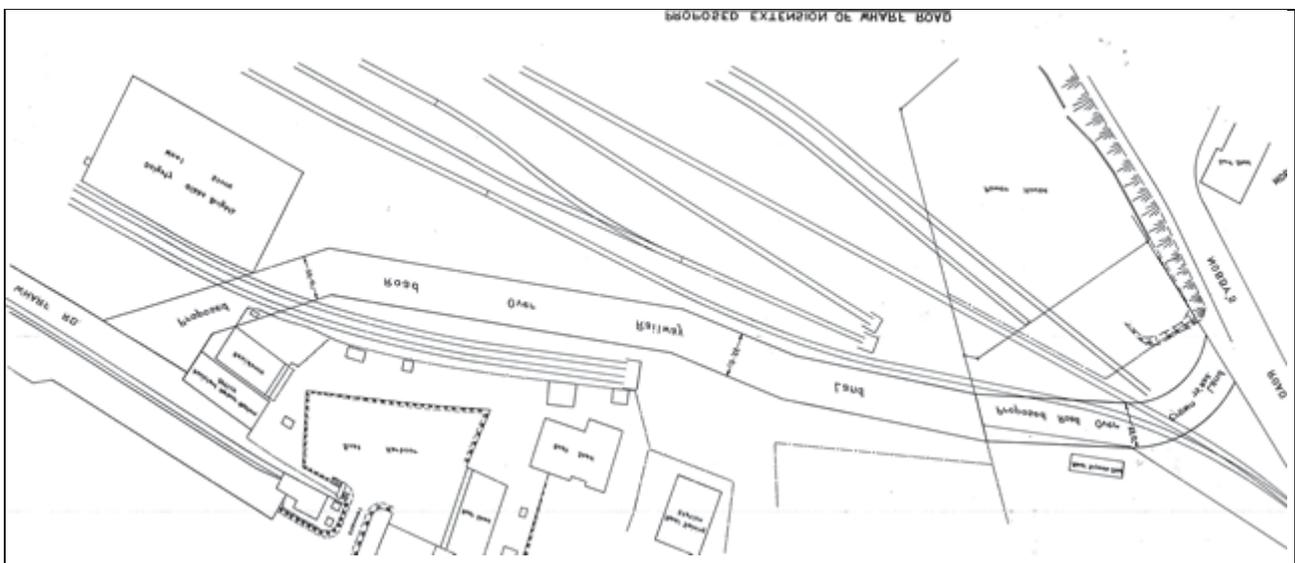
1955 Plan showing proposed extension of Wharf Road over Railway Land
